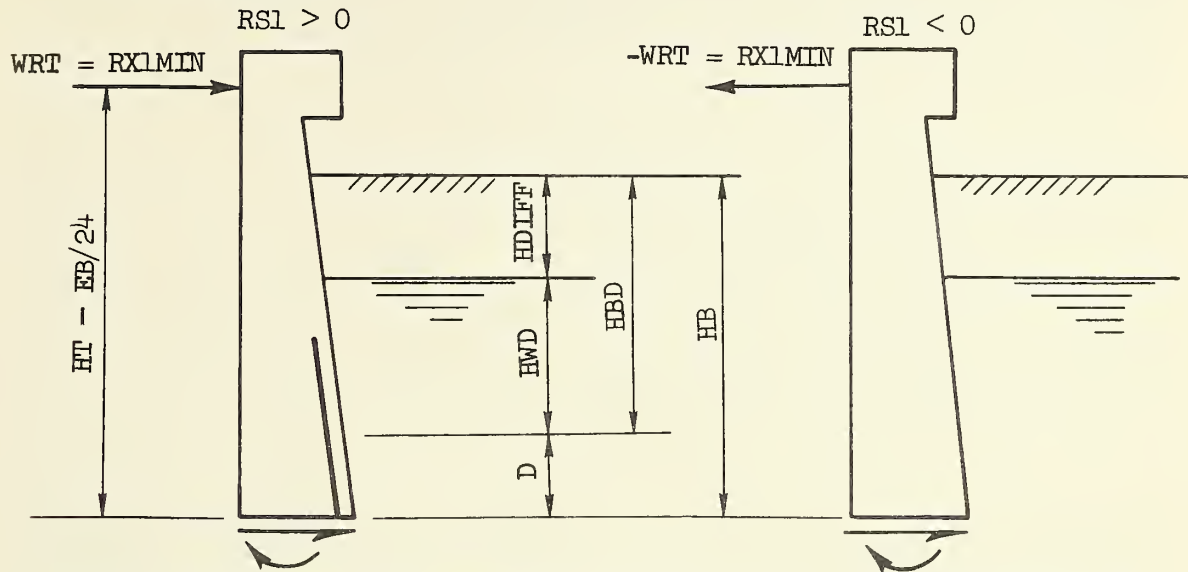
Shear and moment at bottom of wall, LC#1 when  $H_B > H_{W1}$ .
